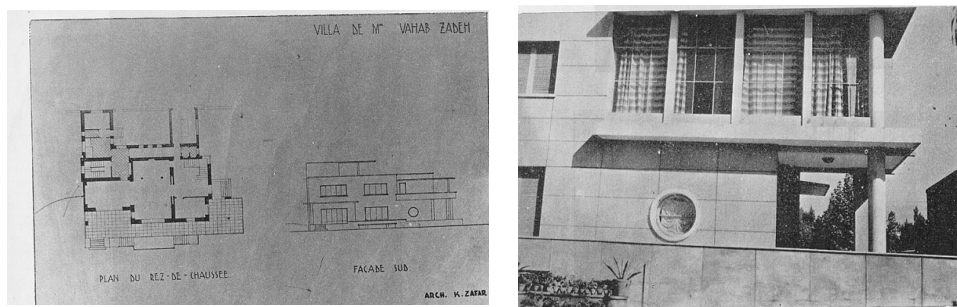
Exterior Façade and Plan of a House related to Pahlavi II in Tehran (Architect 1926)
